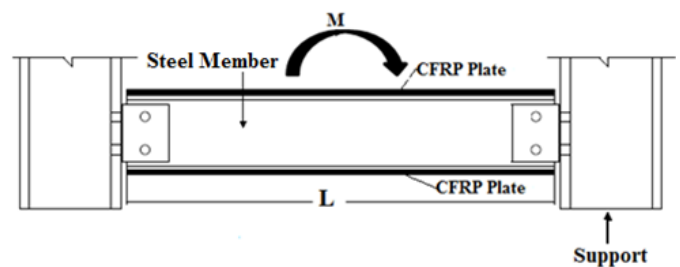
Torsionally loaded steel I-section member with CFRP plates bonded at top and bottom.
